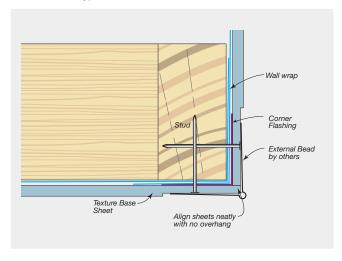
Typical External Corner Jointing – refer to coating manufactuerer's specifications
